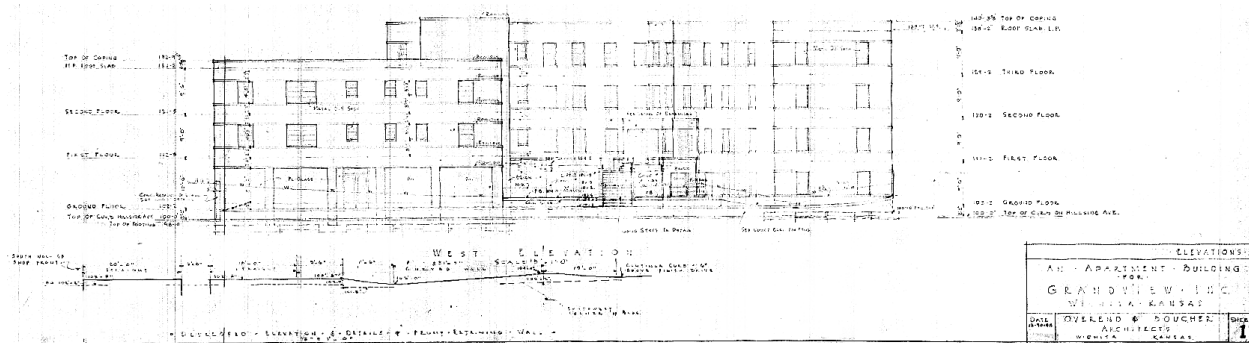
An Apartment Building for Grandview, Inc. -Overend & Boucher Architects, Wichita, KS. 12-30-1948
